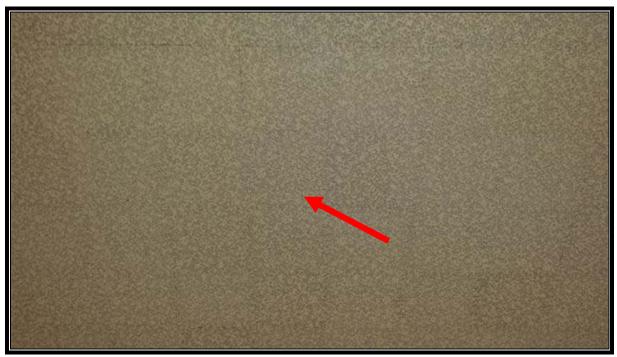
1'x1' Gouged Ceiling Tile, Gray
